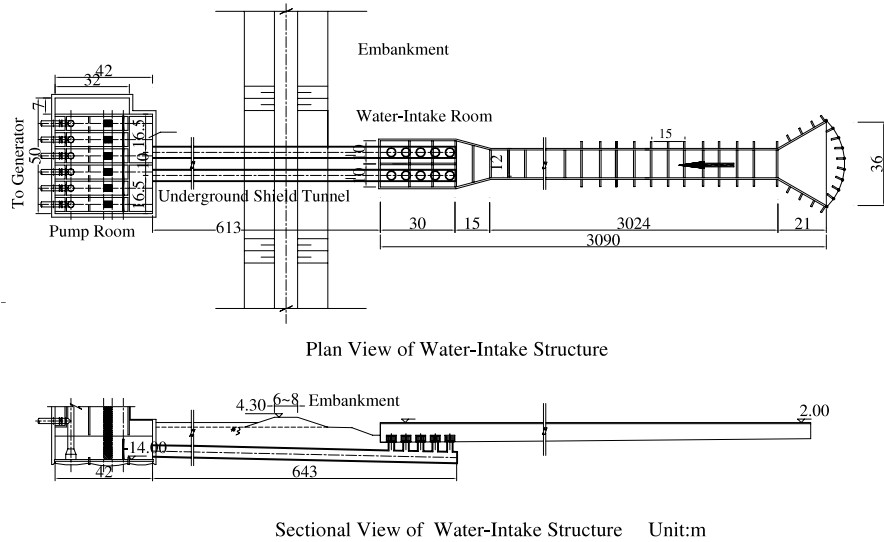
Layout of the water-intake structure for Dongying power plant (Unit: m).
